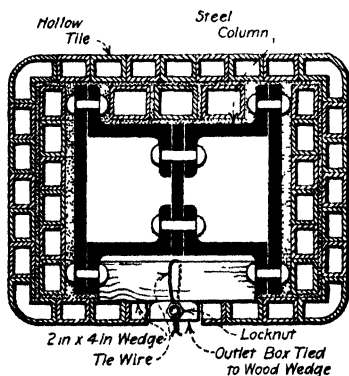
Transverse section of supporting block wedged between column flanges.
